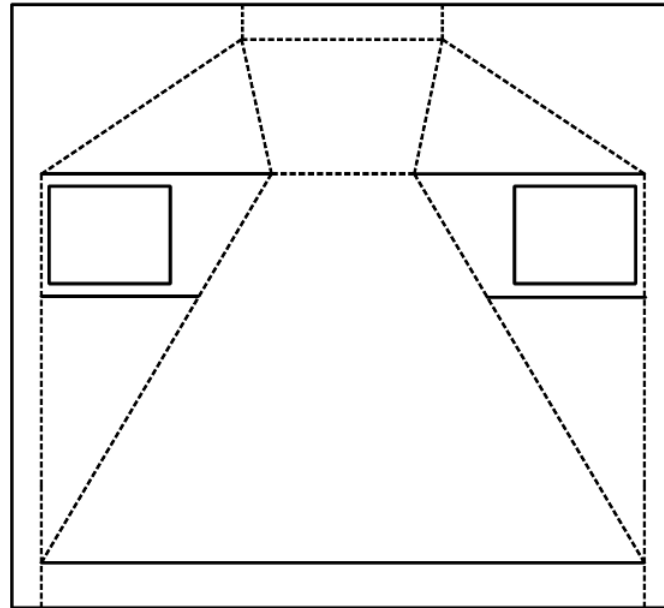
Strut and Tie model for Case 4.2 without prestressed reinforcement
